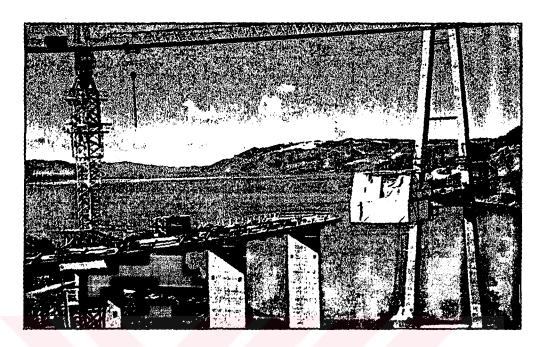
ERECTION OF THE GIRDER (Courtesy of S. Vegvesen, 1994)
